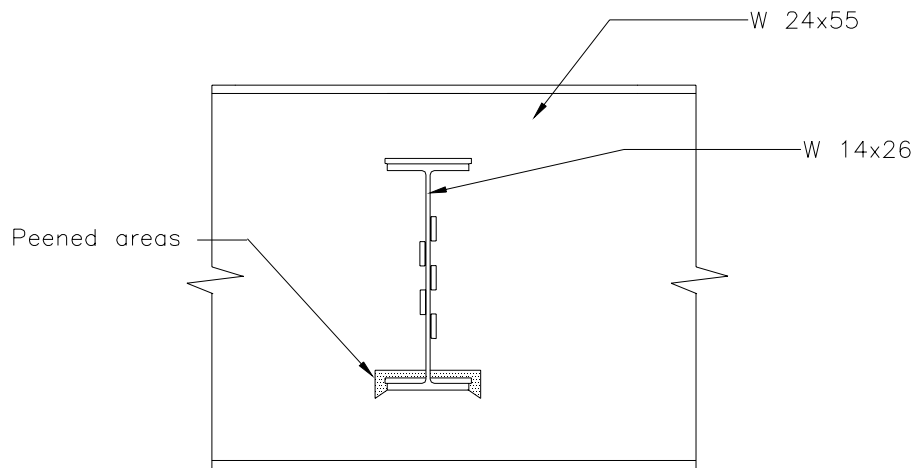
Peened areas around bottom flange weld toes
